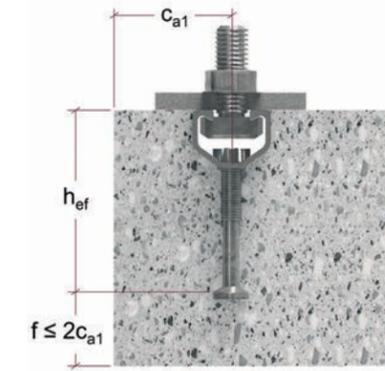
Anchor channel at the edge of thin concrete member
